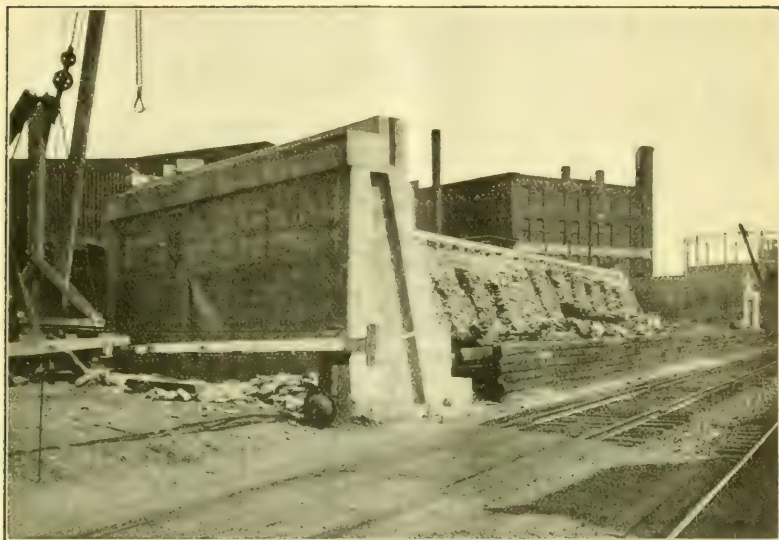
ABUTMENT AND DRY STONE PACKING, EAST SIDE.
